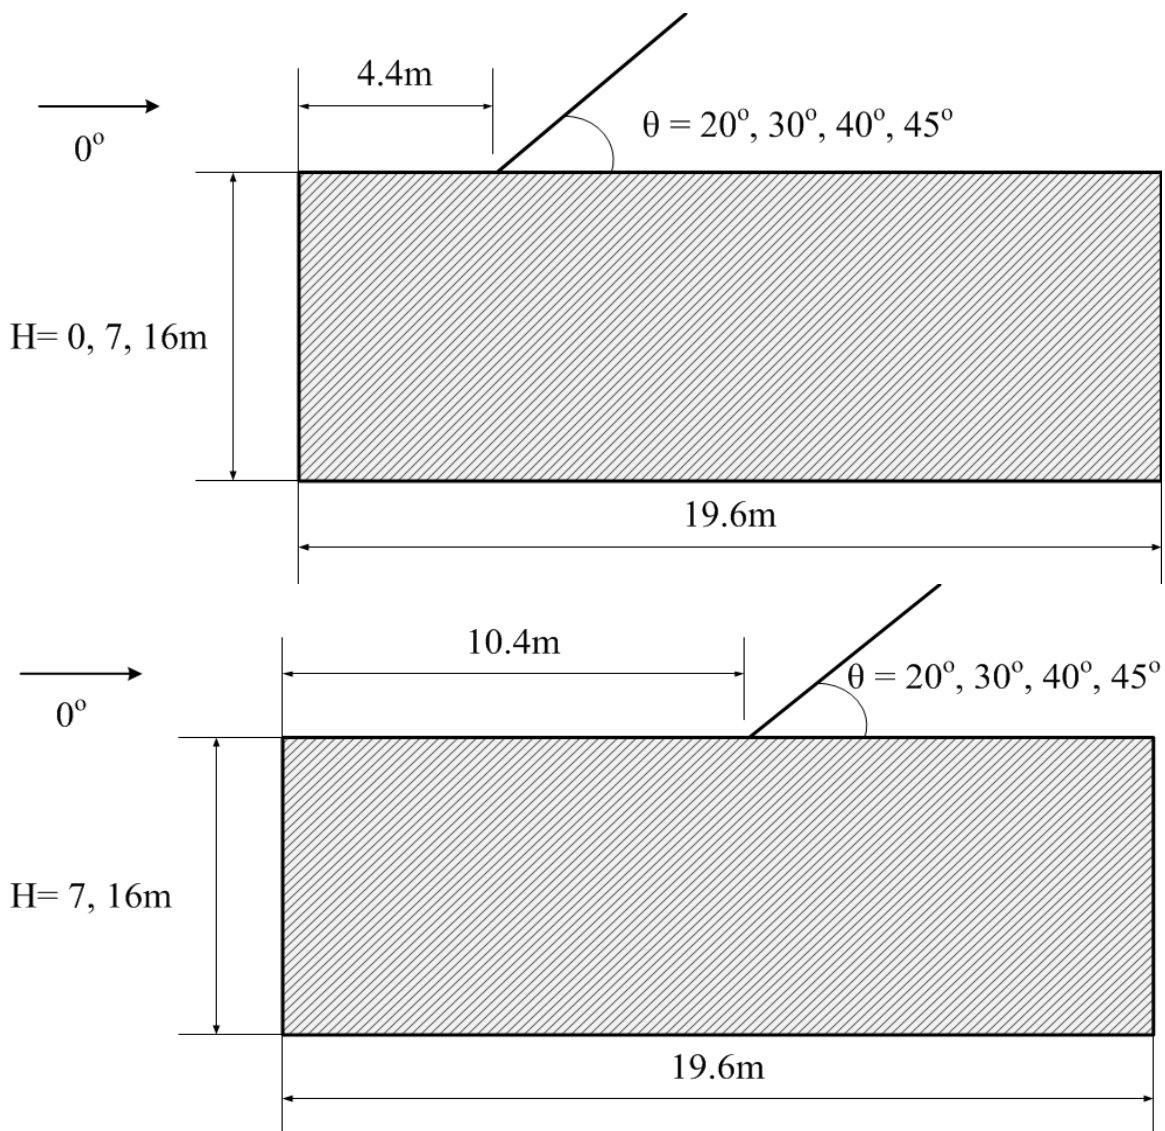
Elevation of building models with inclined solar panels attached
